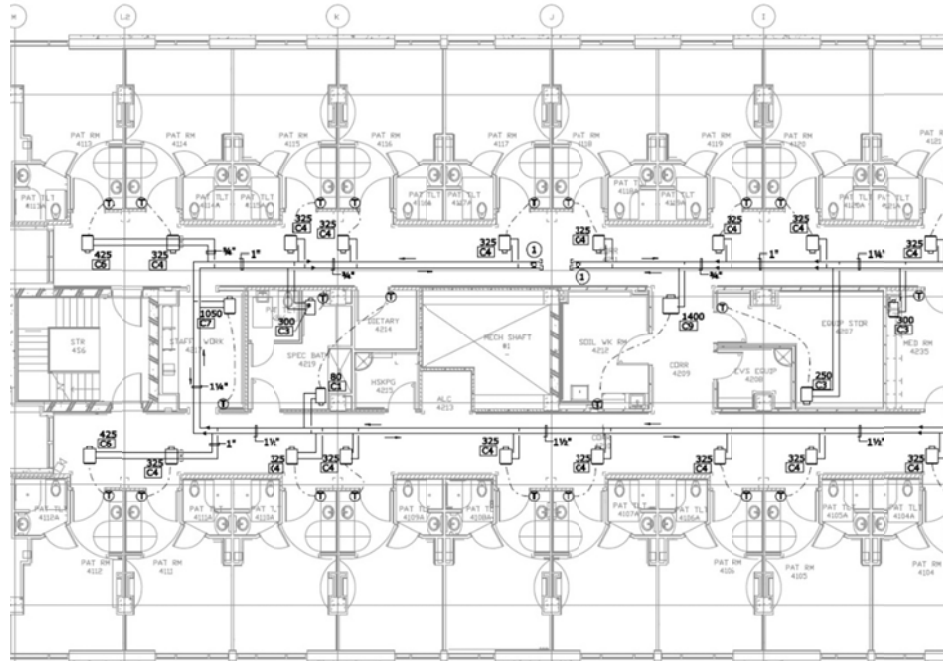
4<sup>th</sup> Floor Hydronic Piping Plan. 100% Construction Documents, Courtesy HKS, Inc.
